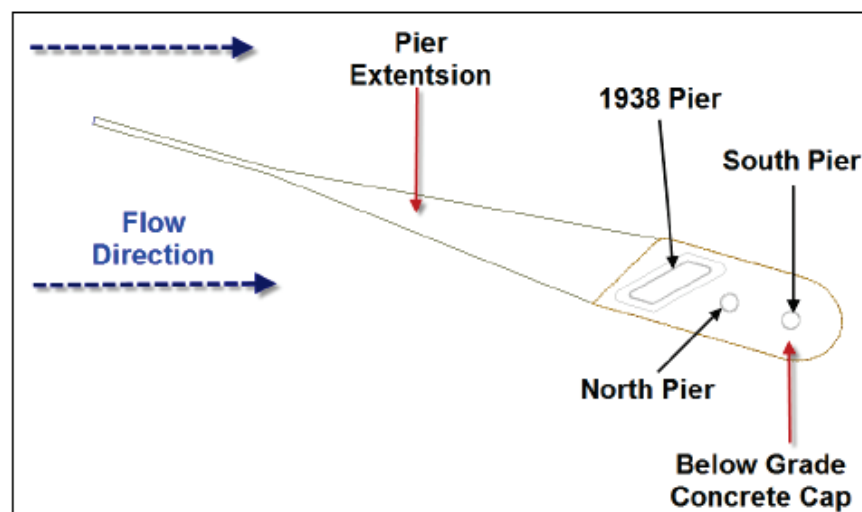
Proposed bridge pier set protection design, with 16 degree skew, for the Burlington Northern Santa Fe railroad bridge pier set evaluated in the physical model.
